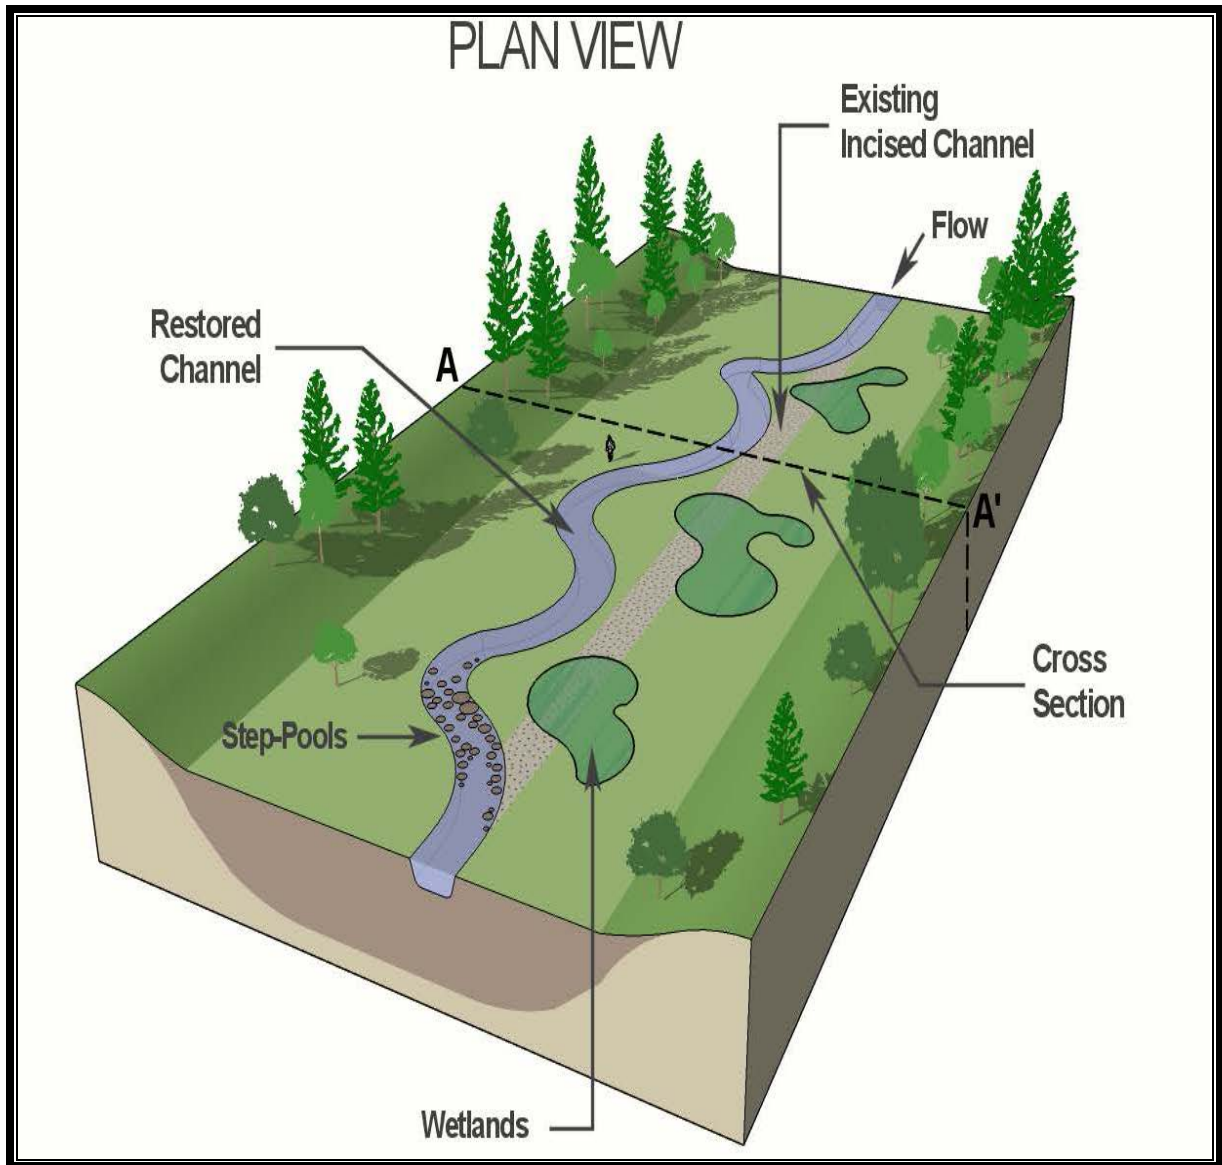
P1-FLOODPLAIN RECONNECTION APPROACH-PLAN VIEW
